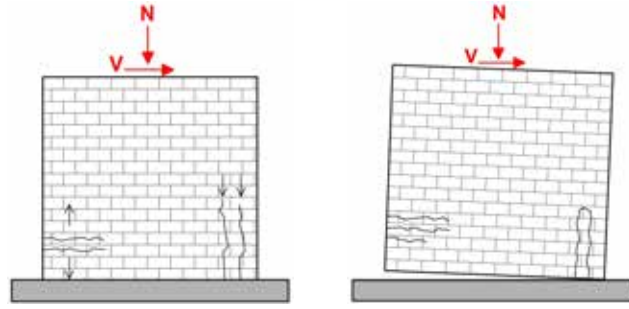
Principal failure mechanism for large dimensions panels; from left to right:(a) bending; (b) diagonal traction.
